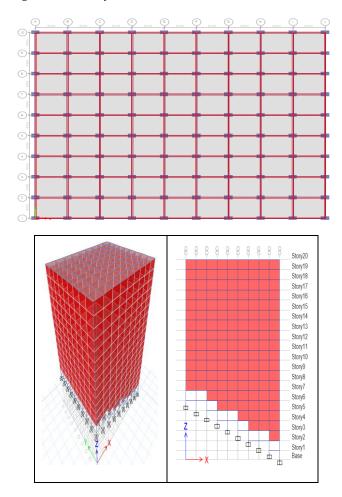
Plan layout, 3D and Elevation view of Model-2.
